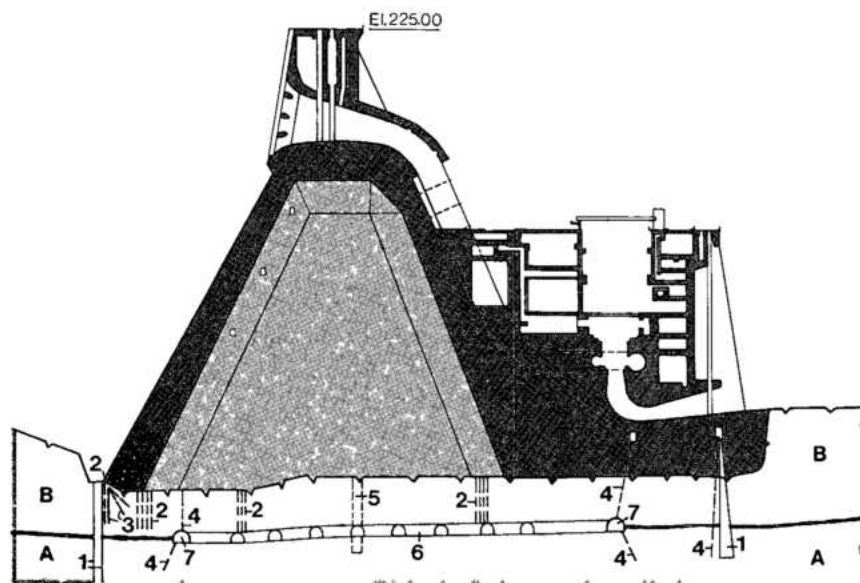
Main dam and powerhouse foundation treatment cross section
